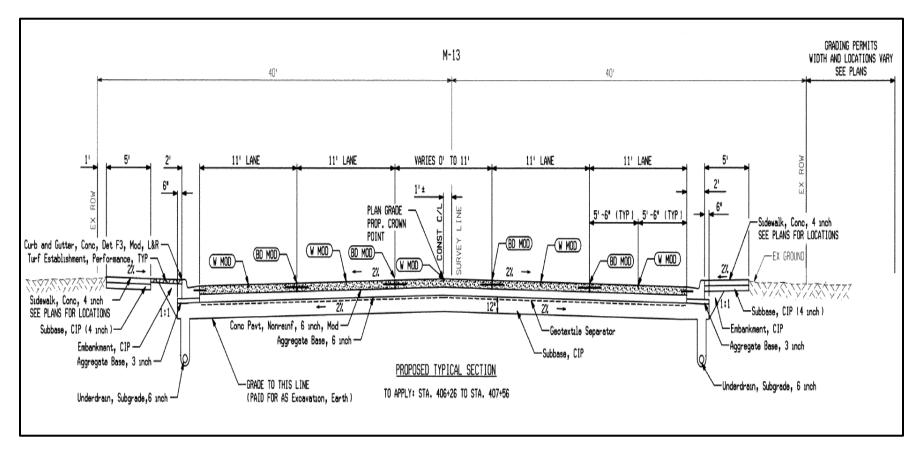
Proposed Typical Section M-13 (4 lanes)
